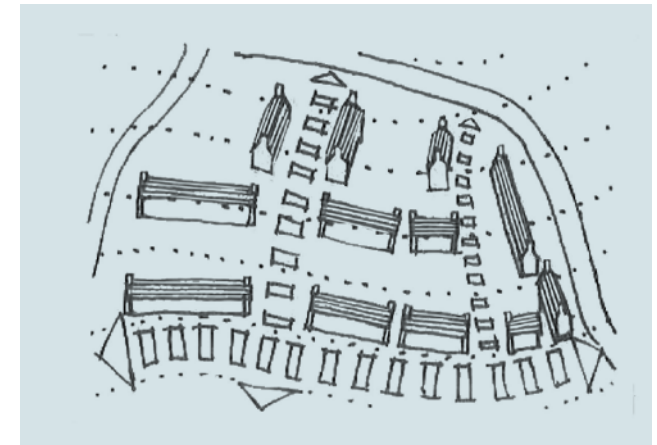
Sketch showing how the building and street alignment can be adapted to follow the contours of the land.
